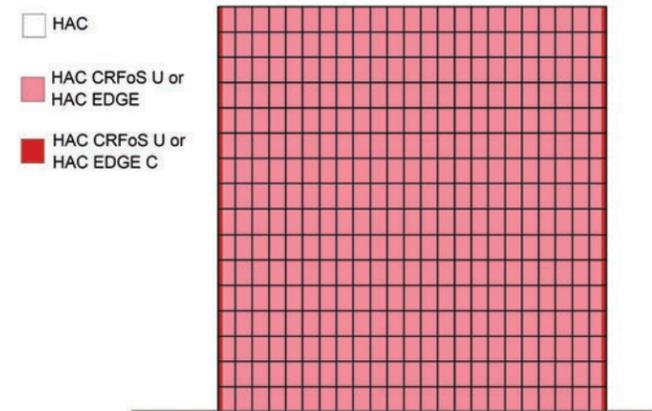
Typical anchor channel layout for composite slabs
